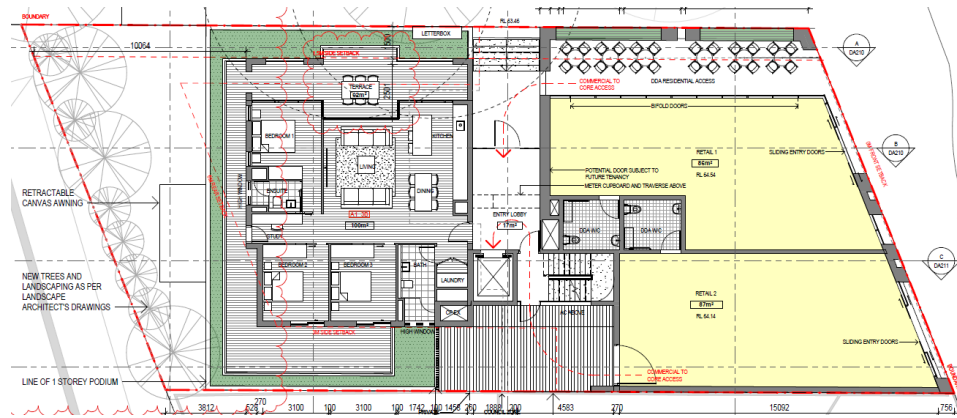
Proposed level 1 floor plan - 18-20A Perouse Road, Randwick (Source: Curzon & Partners)
